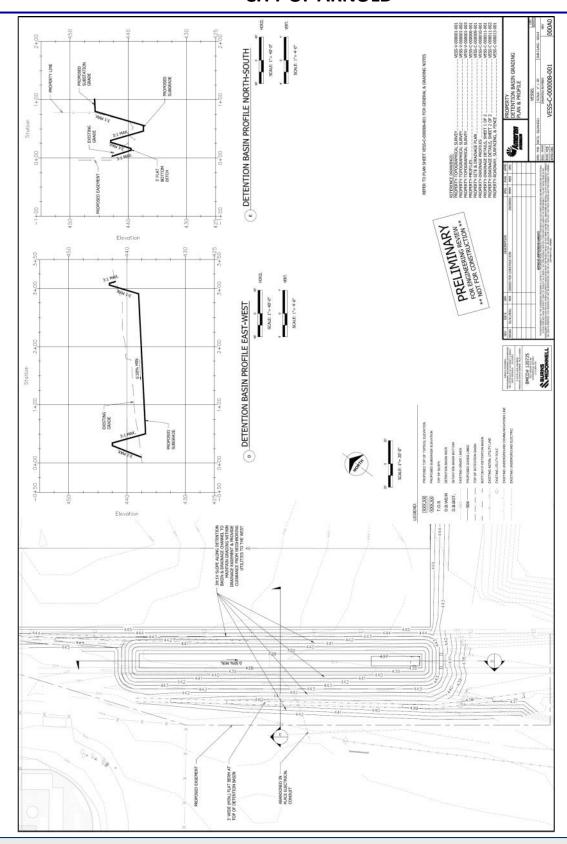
EXHIBIT B: CIVIL PLANS, 3 (DETENTION BASIN GRADING PLAN & PROFILE)
